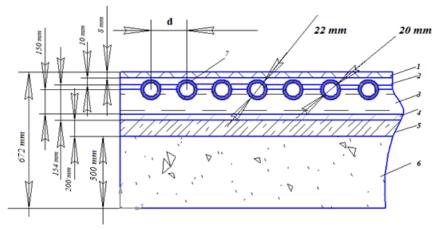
Structural diagram of a heating system with warm floors of a typical rural house: 1-laminate, 2-segment screed, 3-paraffins, 4-metal box for storing paraffin, 5-polystyrene foam, 6-warm floor slab, 7-warm floor system pipes.
